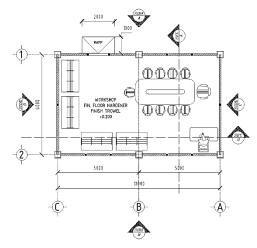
Expansion Floor Plan Source: Author's Processing (2025)
